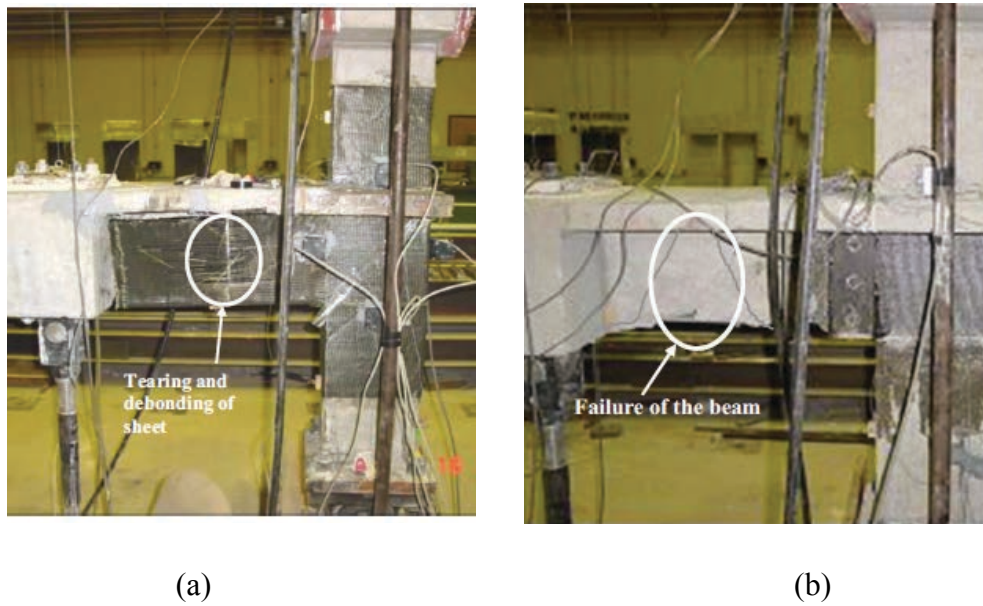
Failure mode of strengthened specimen after test (Alsayed et al., 2010): (a) Tearing and debonding of sheet of repaired joint ER1; (b) Beam failure of repaired joint ER2.
